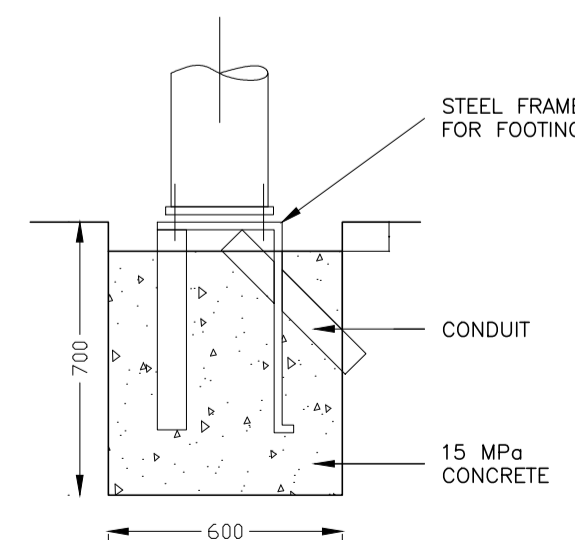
H: PLAN FOR FOOTING OF STANDARD POLE
